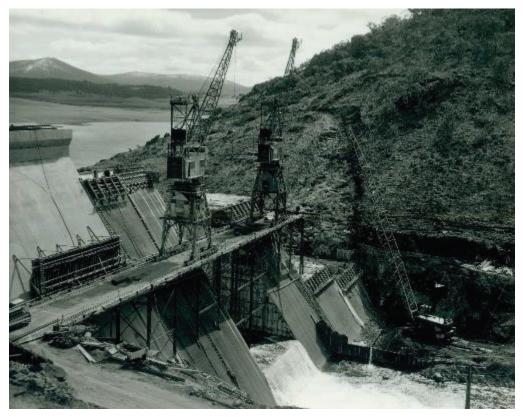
Tantangara Dam wall during construction. Source: Steve Brayshaw.
